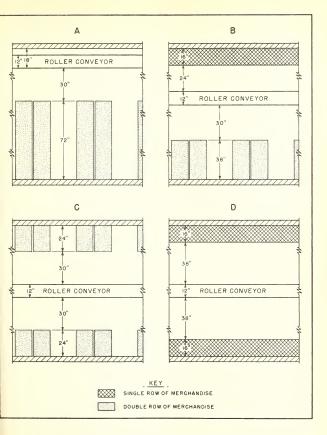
Alternative merchandise stacking layouts in a 10-foot-wide grocery storeroom.
